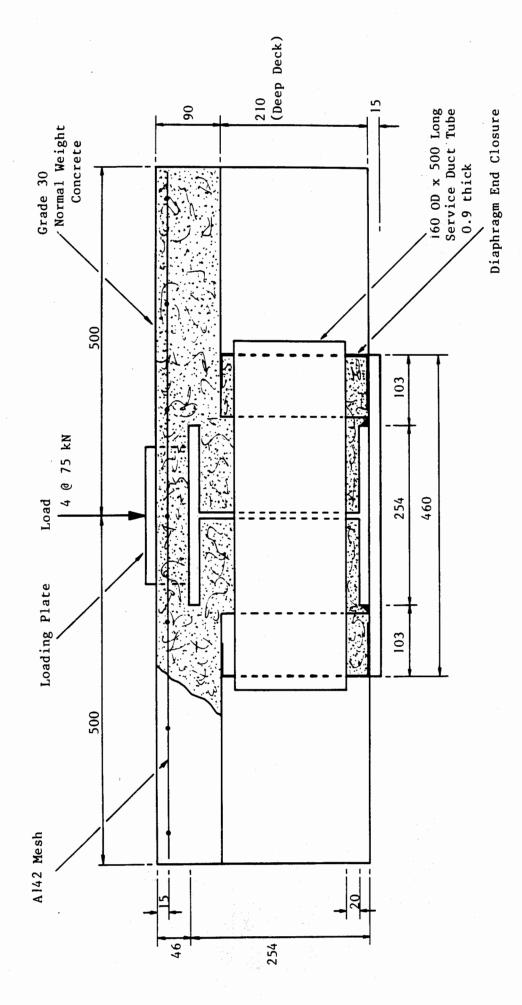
DIMENSIONAL DETAILS OF PMF 210 mm DEEP CLOSURE FLASHING - TEST NO. WFRC 56867
